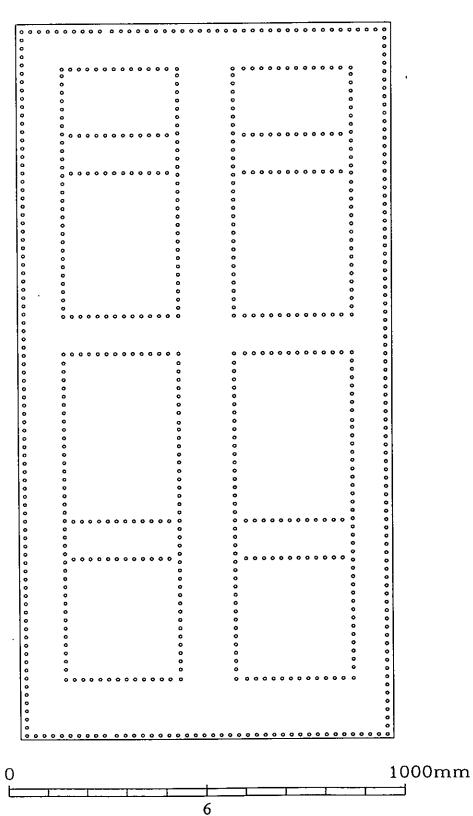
Elevation of the north side of the baize door, showing a pattern of nails which relates to a four panel door design
